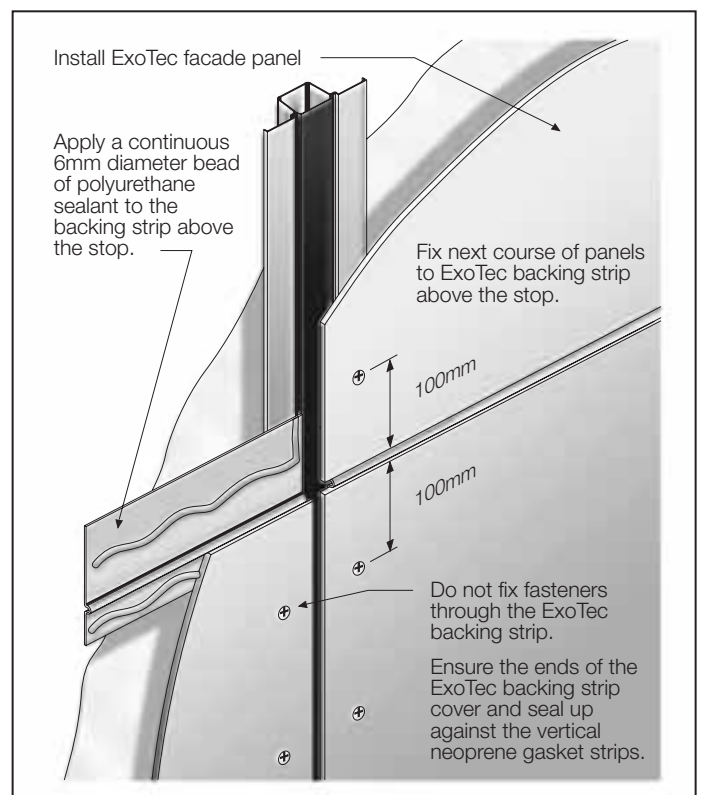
INSTALLING NEXT COURSE OF PANELS DETAILS
